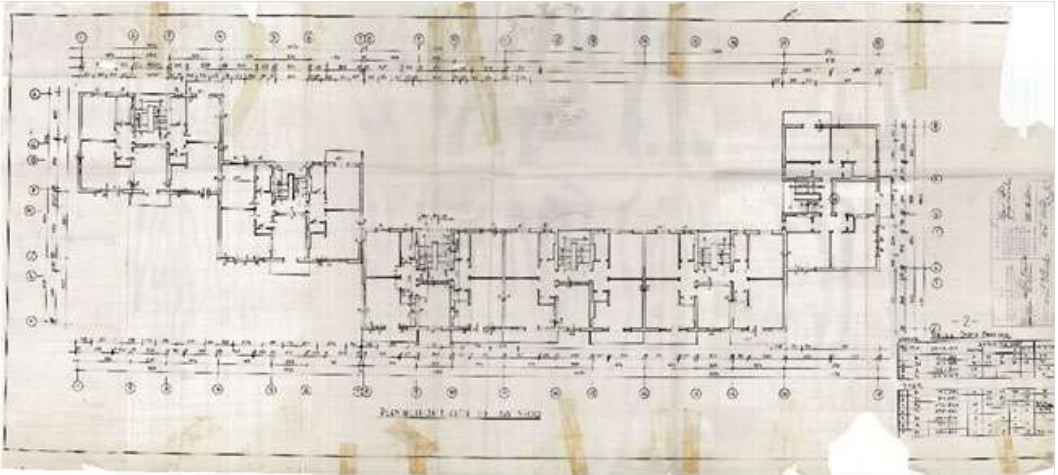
Original normal floor plan of apartment Type 2 (Source: AQTN).
